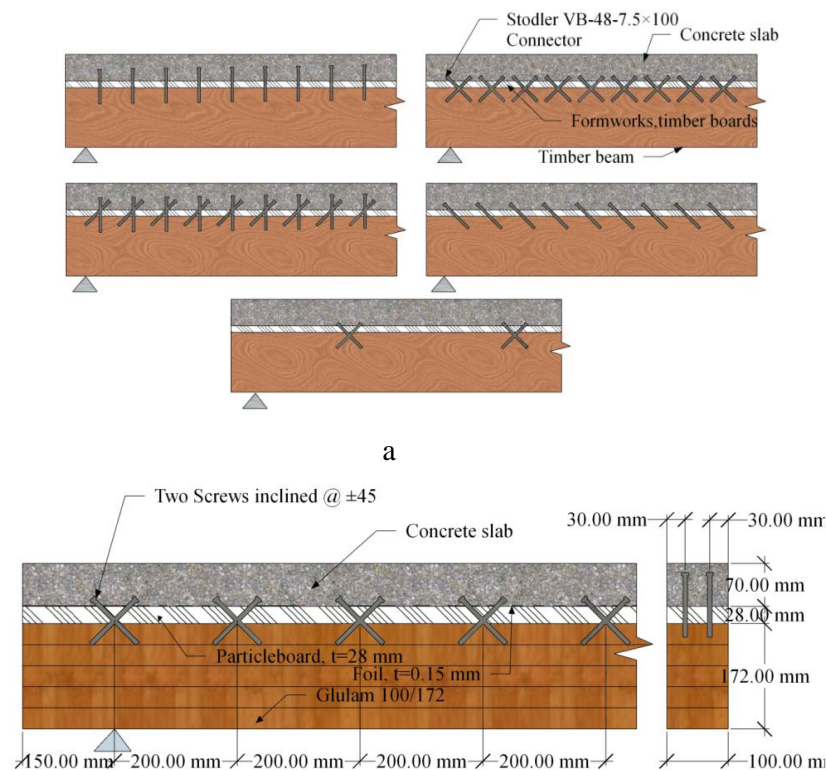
Mechanical fasteners as shear connectors in a TCC system: a) picture adapted from [14]; b) picture adapted from [8].
